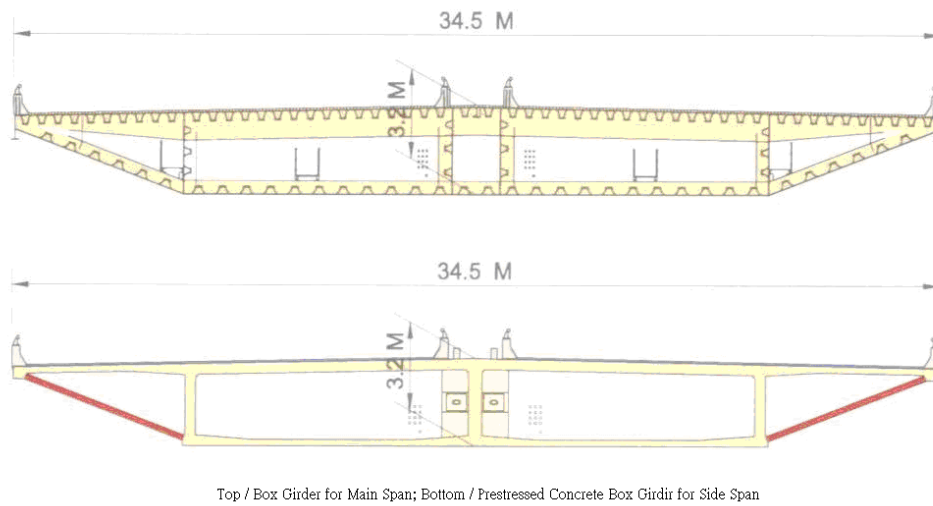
Cross Section of Kao Ping Hsi Cable-Stayed Bridge (Taiwan Area National Expressway Engineering Bureau, 2002)
